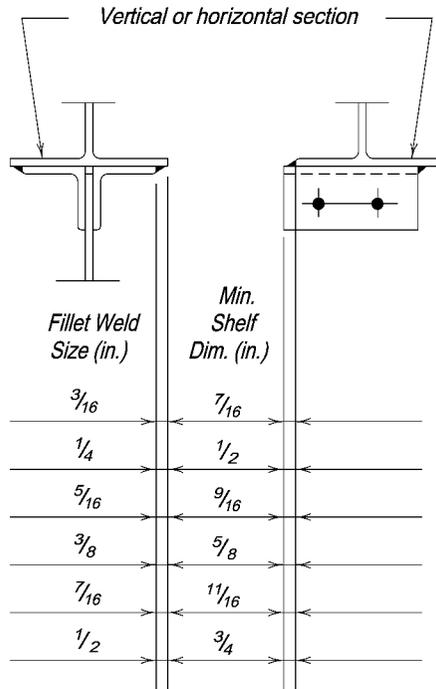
Recommended minimum shelf dimensions for SMAW fillet welds.
